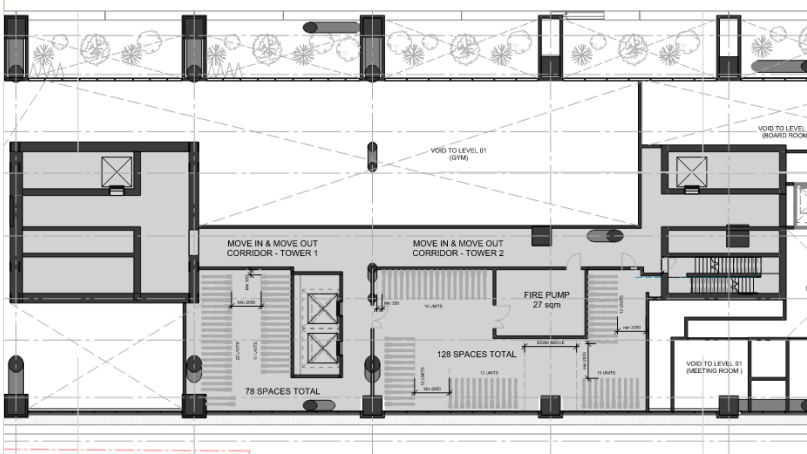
Amended Level 2 GA Plan illustrating bicycle parking spaces (Source: Woods Bagot)
